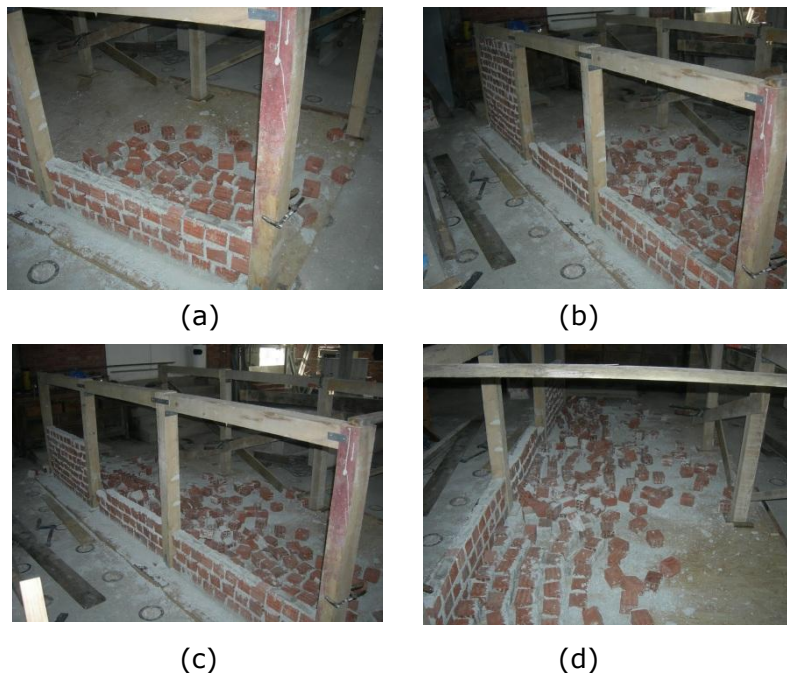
Photo of (a) failure of the third wall, (b) failure of the second and the third walls, (c) failure of all of the three walls and (d) horizontal passage unit after failure
